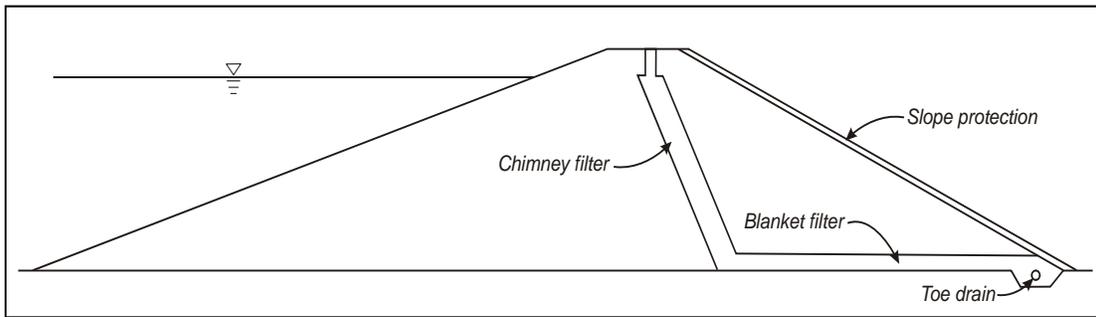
Simple cross section showing a chimney used in a new dam.
